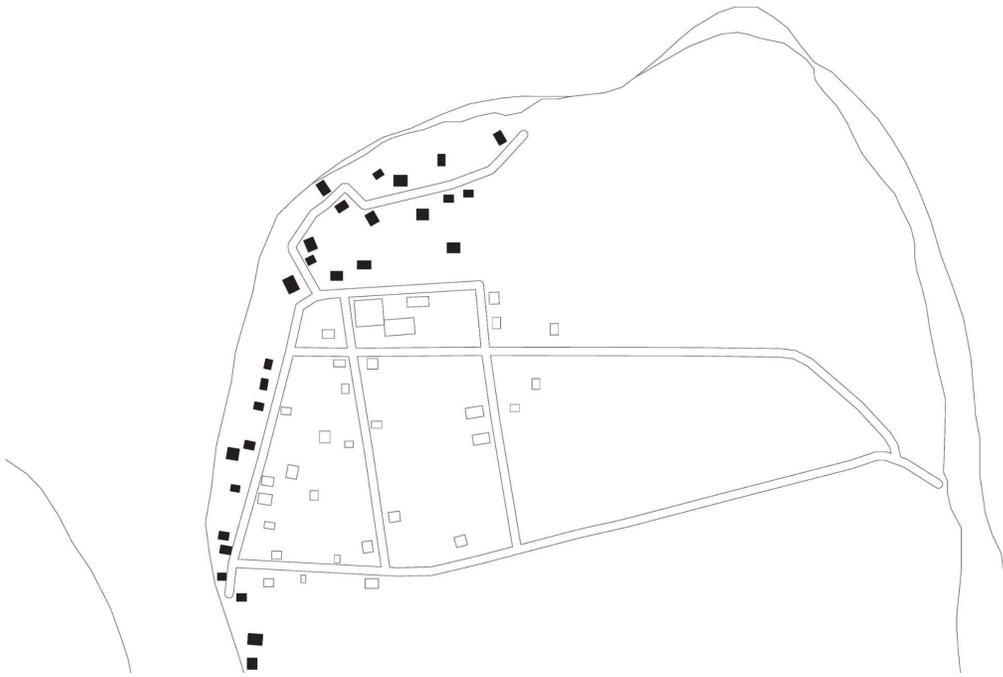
, Existing Site Plan: Flood-Prone Homes. (Source: Author)
